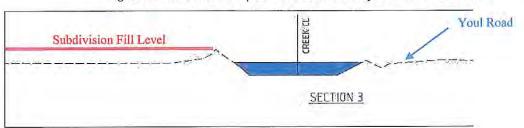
Model 3 – Proposed Subdivision Layout No. 2 - Section 3
